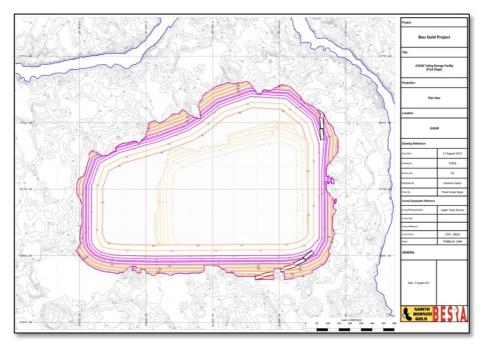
Plan View of Stage 3 of TSF at Jugan
